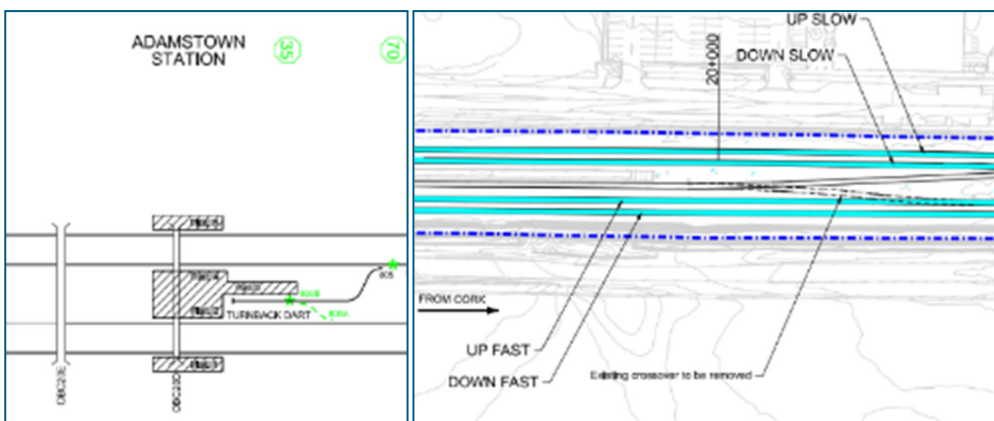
Adamstown Station- Track Plan Layout (1 of 2)
